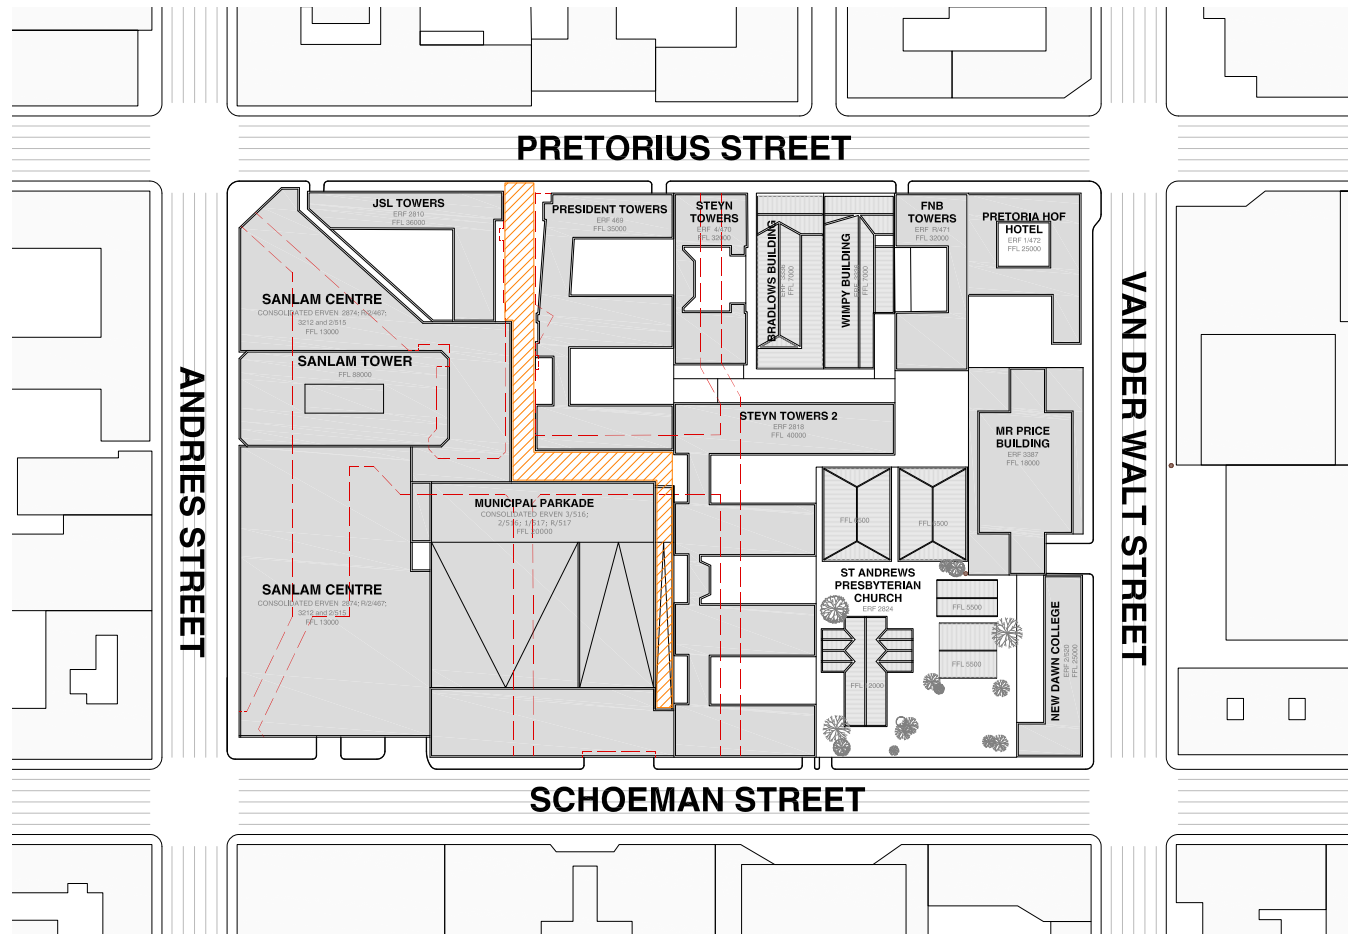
The existing site plan, showing "inbetween space" with the potential to be occupied (Author, 2010).
